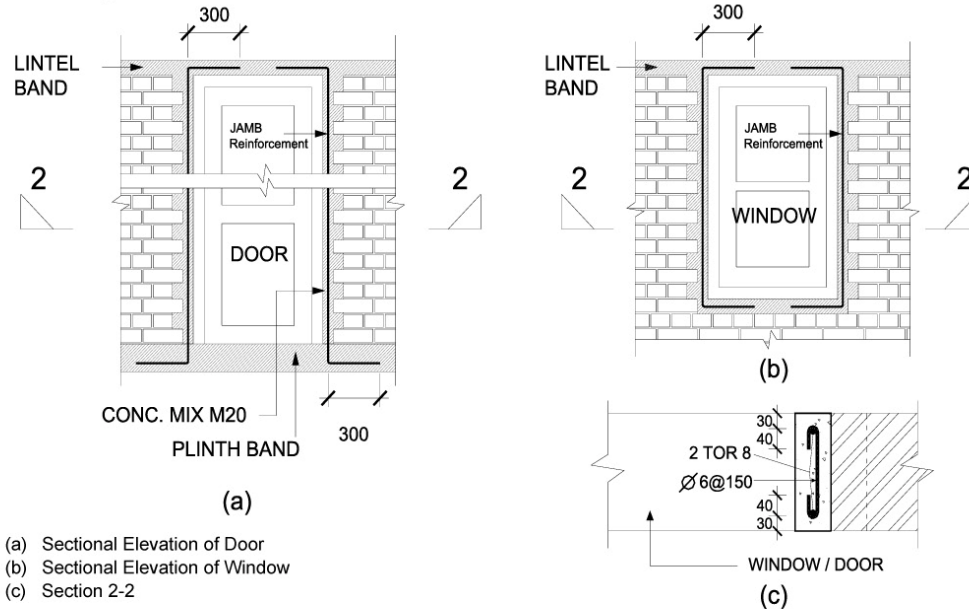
Typical Details of Providing Vertical Steel Bars around doors/windows
